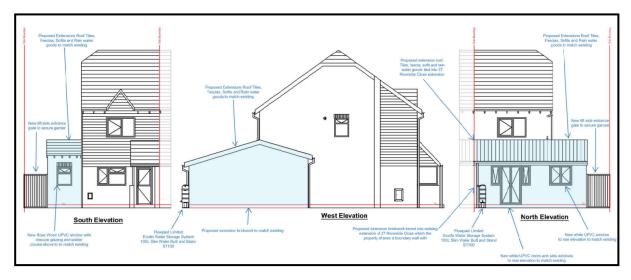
Proposed Elevations with pale blue detail being the proposed extension
